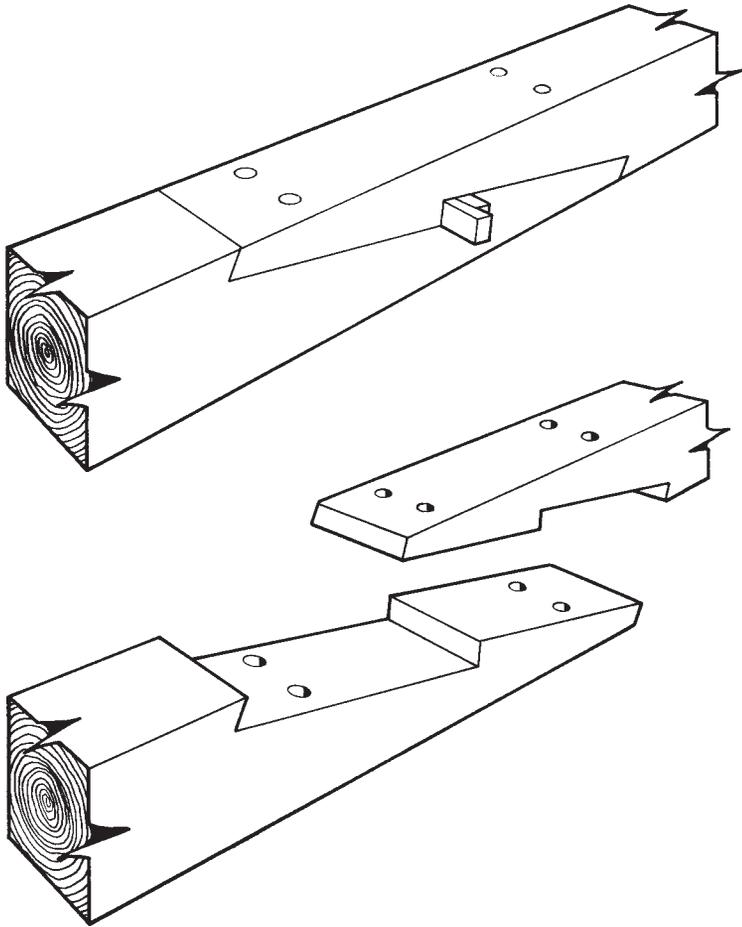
Assembled and exploded views of stop-splayed, undersquinted and wedged scarf with four pins. Folding wedges pre-stress the joint.
